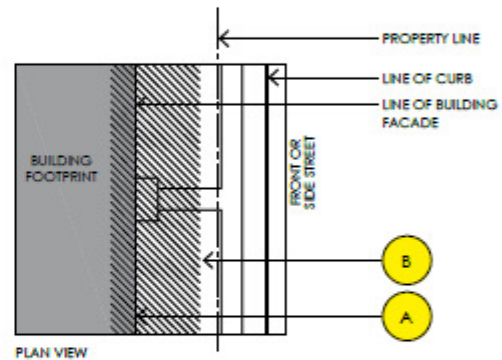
ROWHOUSE BUILDING WITH STOOP
